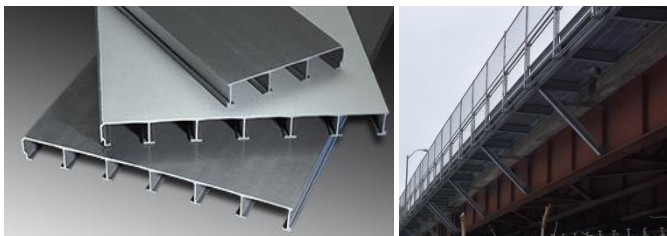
Pultruded Planks and Cantilevered Bridge Walkway (Strongwell and Creative Composites Group)
